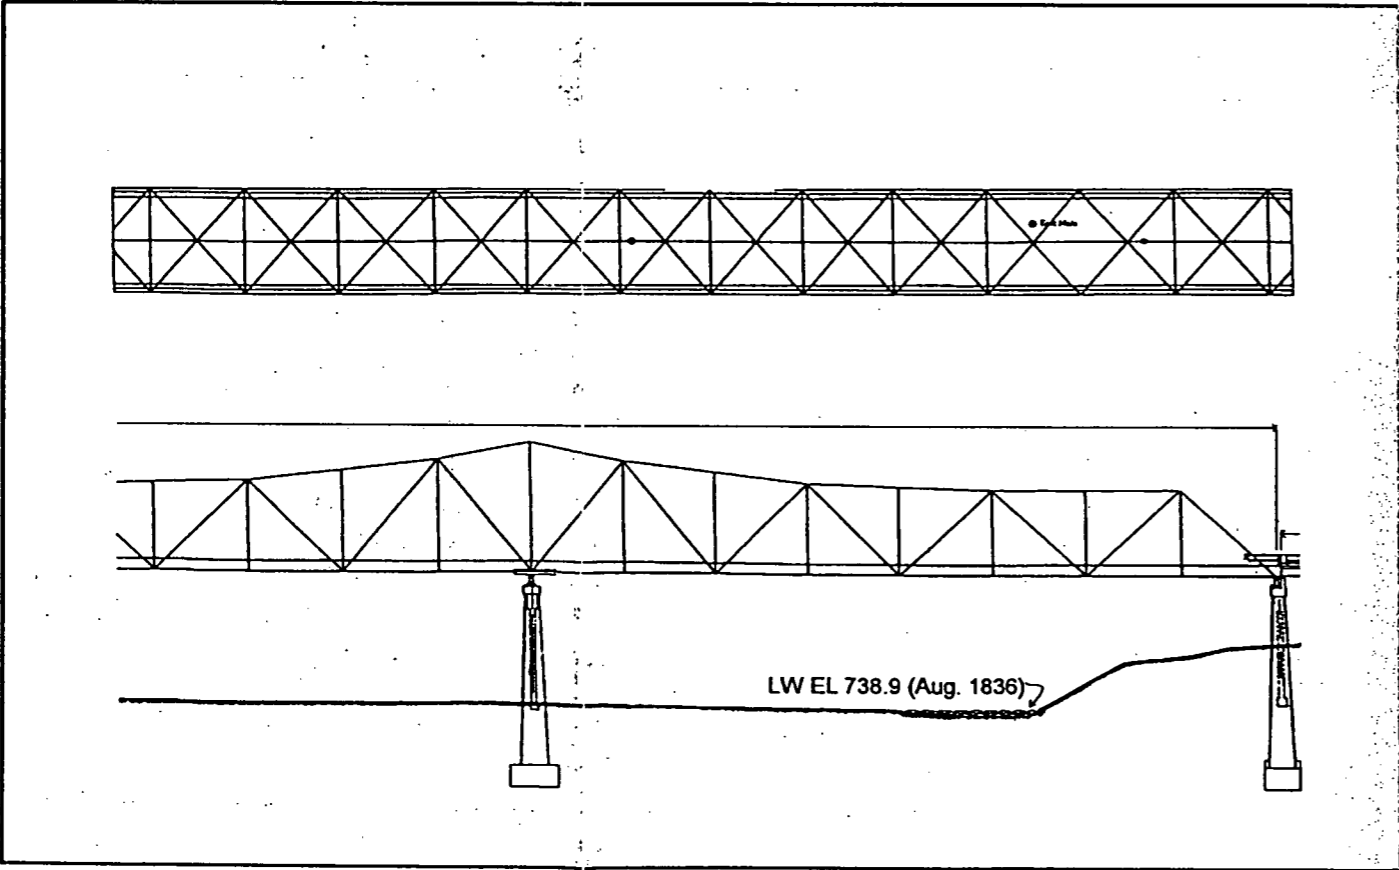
Elevation of the Brazos River bridge as shown in the 1939 plans.
